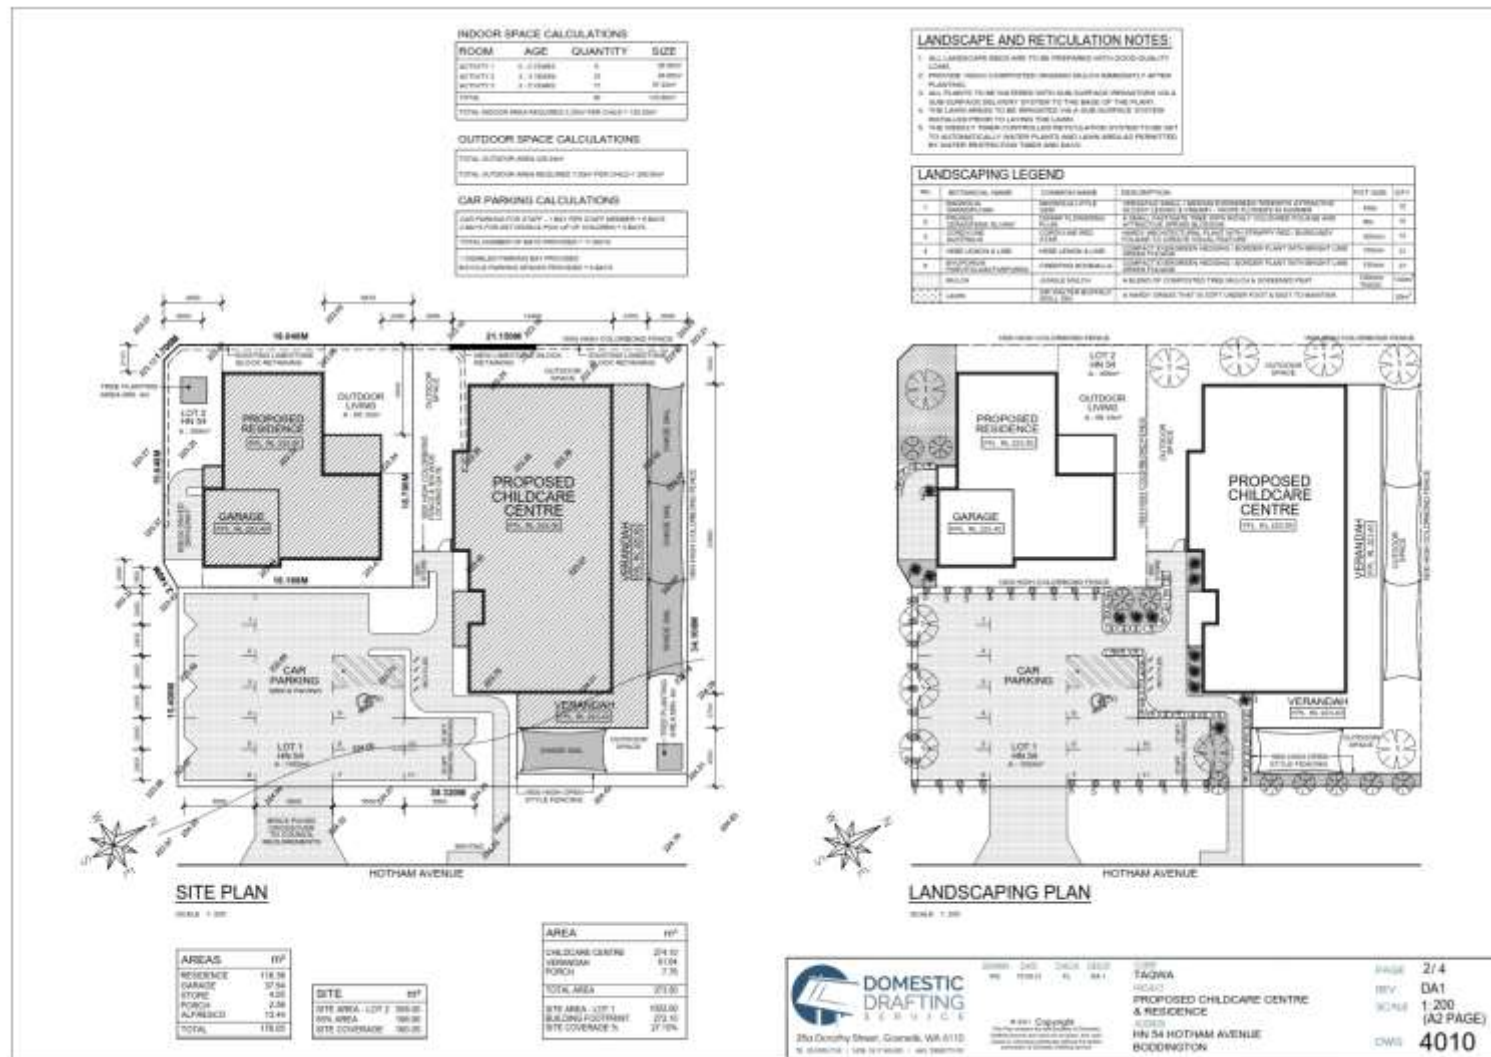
Site Plan including New Residential Premises to the West (source: Domestic Drafting Service)
